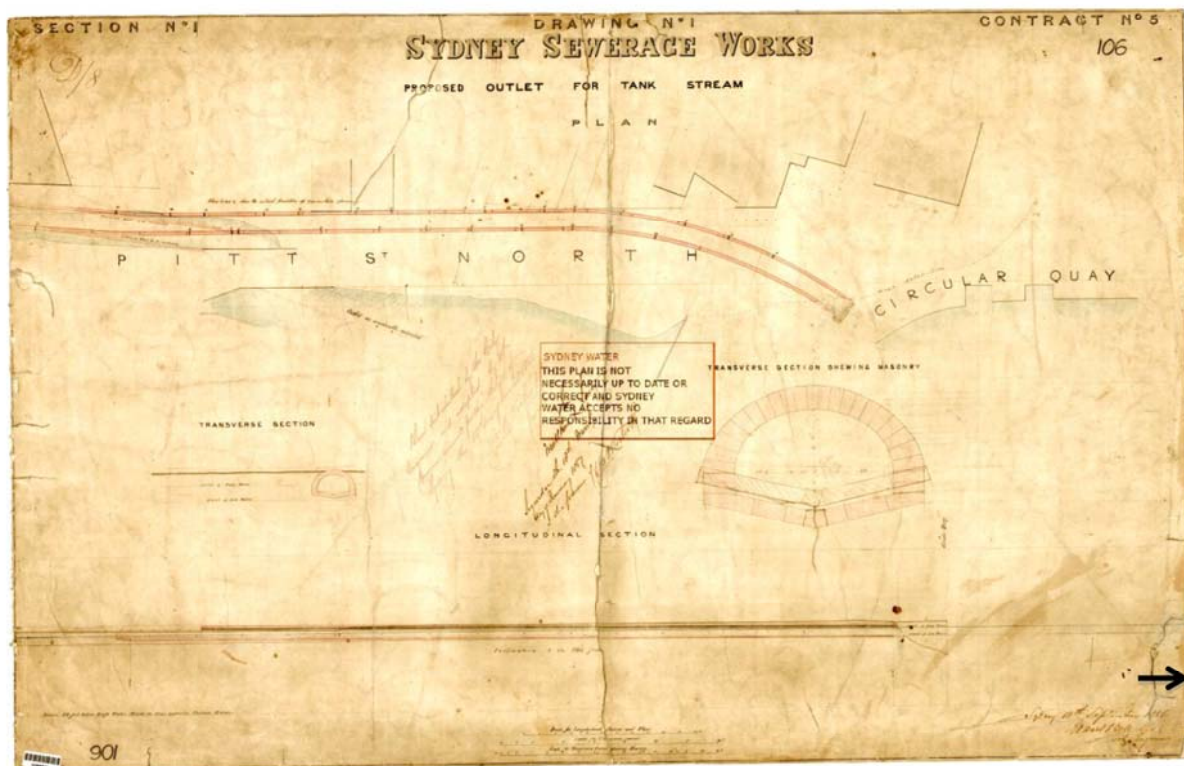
'Drawing No 1' of the Sydney Sewerage Works proposed new outlet for the Tank Stream. The plan and section shows masonry walls with regularly spaced connection points in relation to earlier work that was to be demolished. The original outlet was to be replaced by one at Circular Quay. OCP No 106, 18 Sep 1856, Sydney Water.
